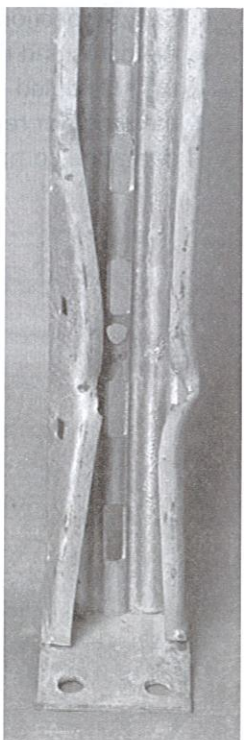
Galvanized steel column damaged by impacts from the rear (Rear view)
